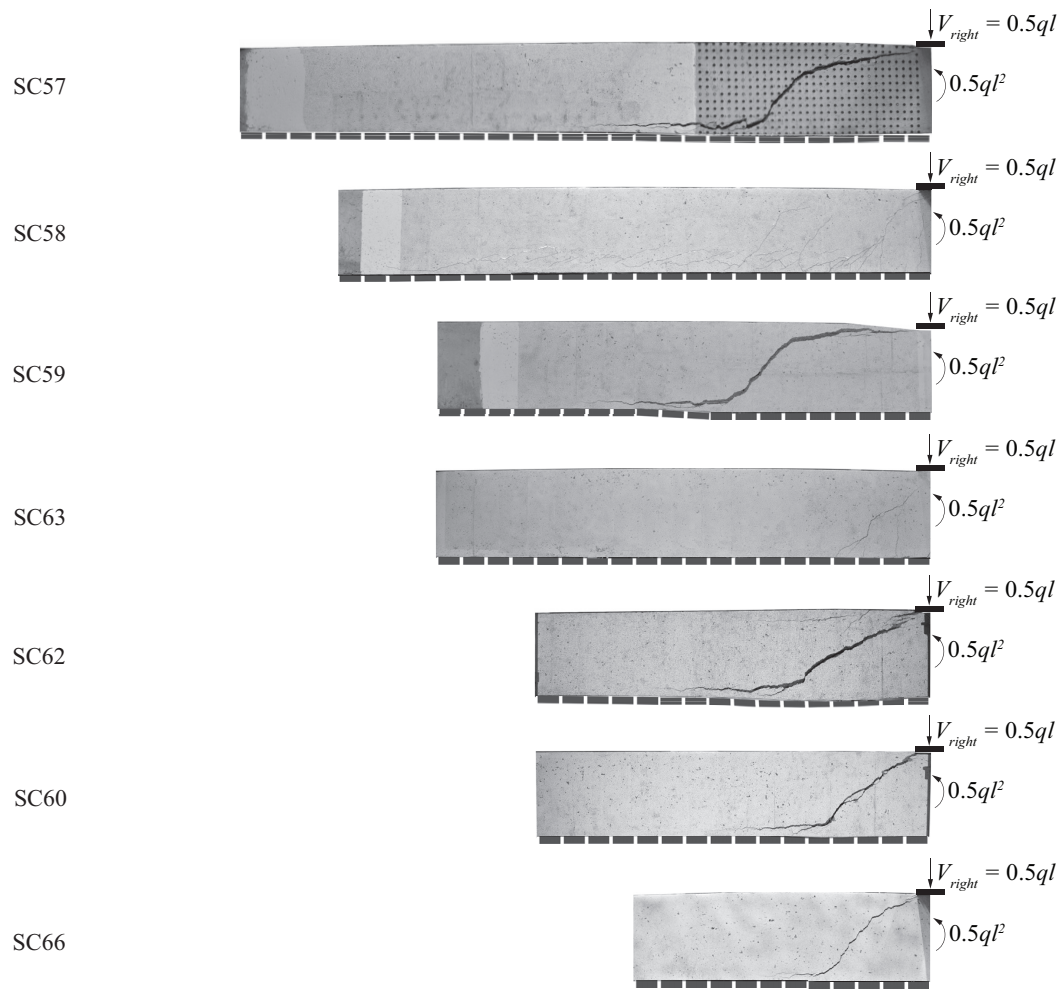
Photos of crack pattern after failure: cantilevers subjected to distributed loading
